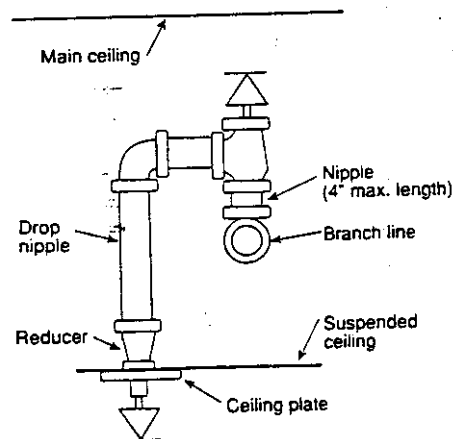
(b) Sprinklers in concealed space and below ceiling.
